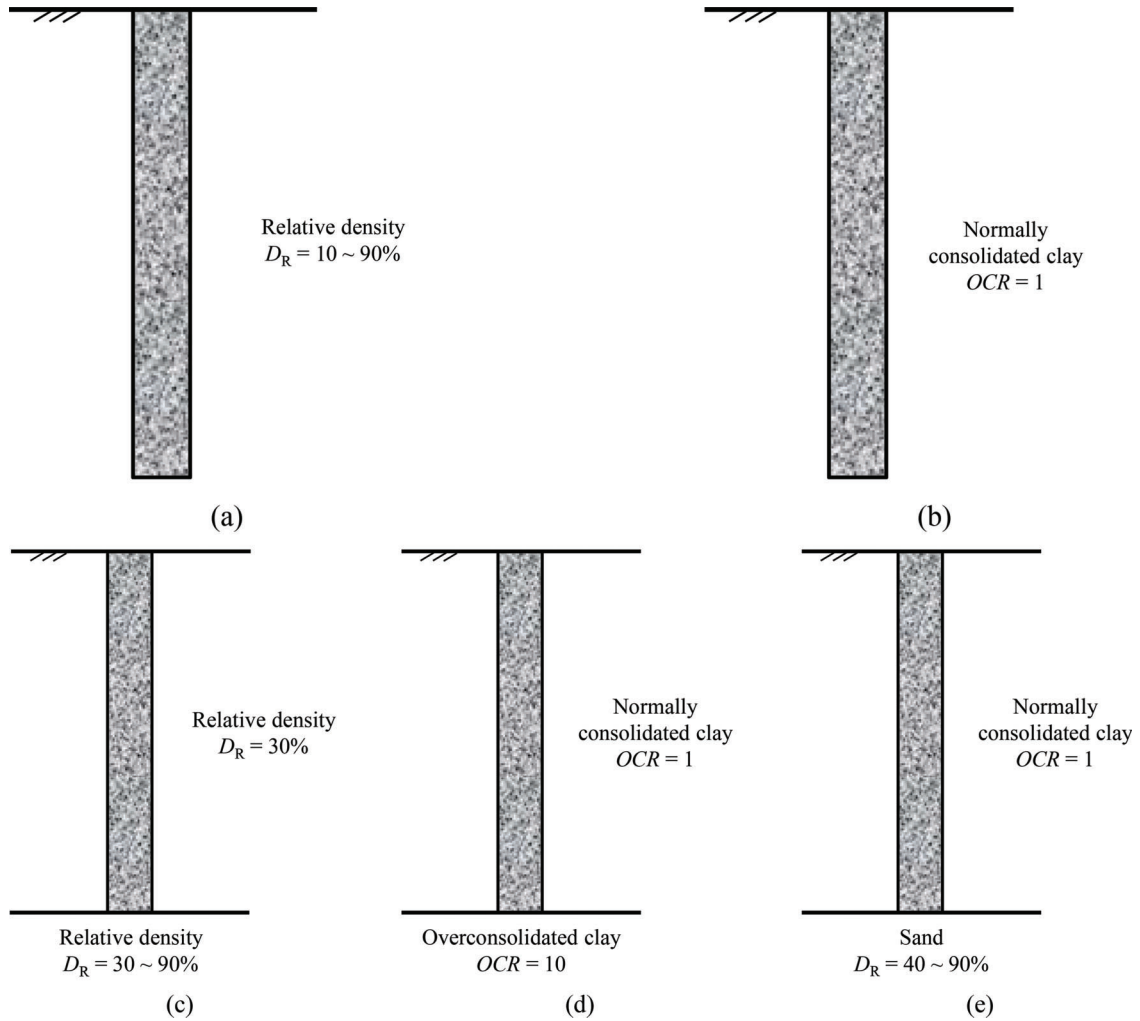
Typical pile-soil profile systems found in pile design: (a) piles in sand of uniform density; (b) a floating pile in clay; (c) an end-bearing pile in sand; (d) an end-bearing pile in clay; (e) a pile crossing clay resting on sand.
